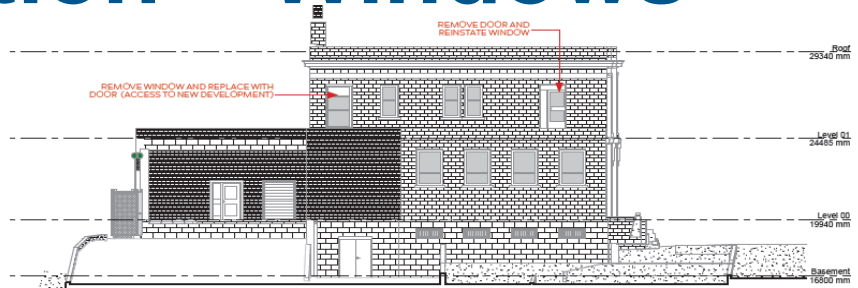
SOUTHWEST WINDOW OPENING TO BE MODIFIED
